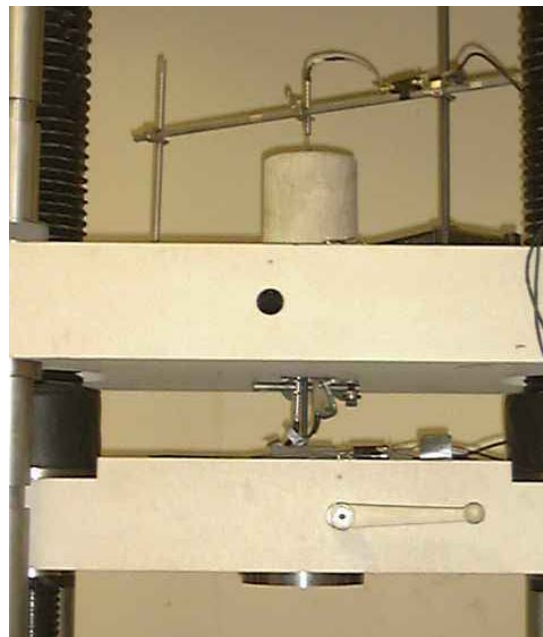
Bond Pullout Test Specimen in Tinius Olsen 120K Universal Machine.
